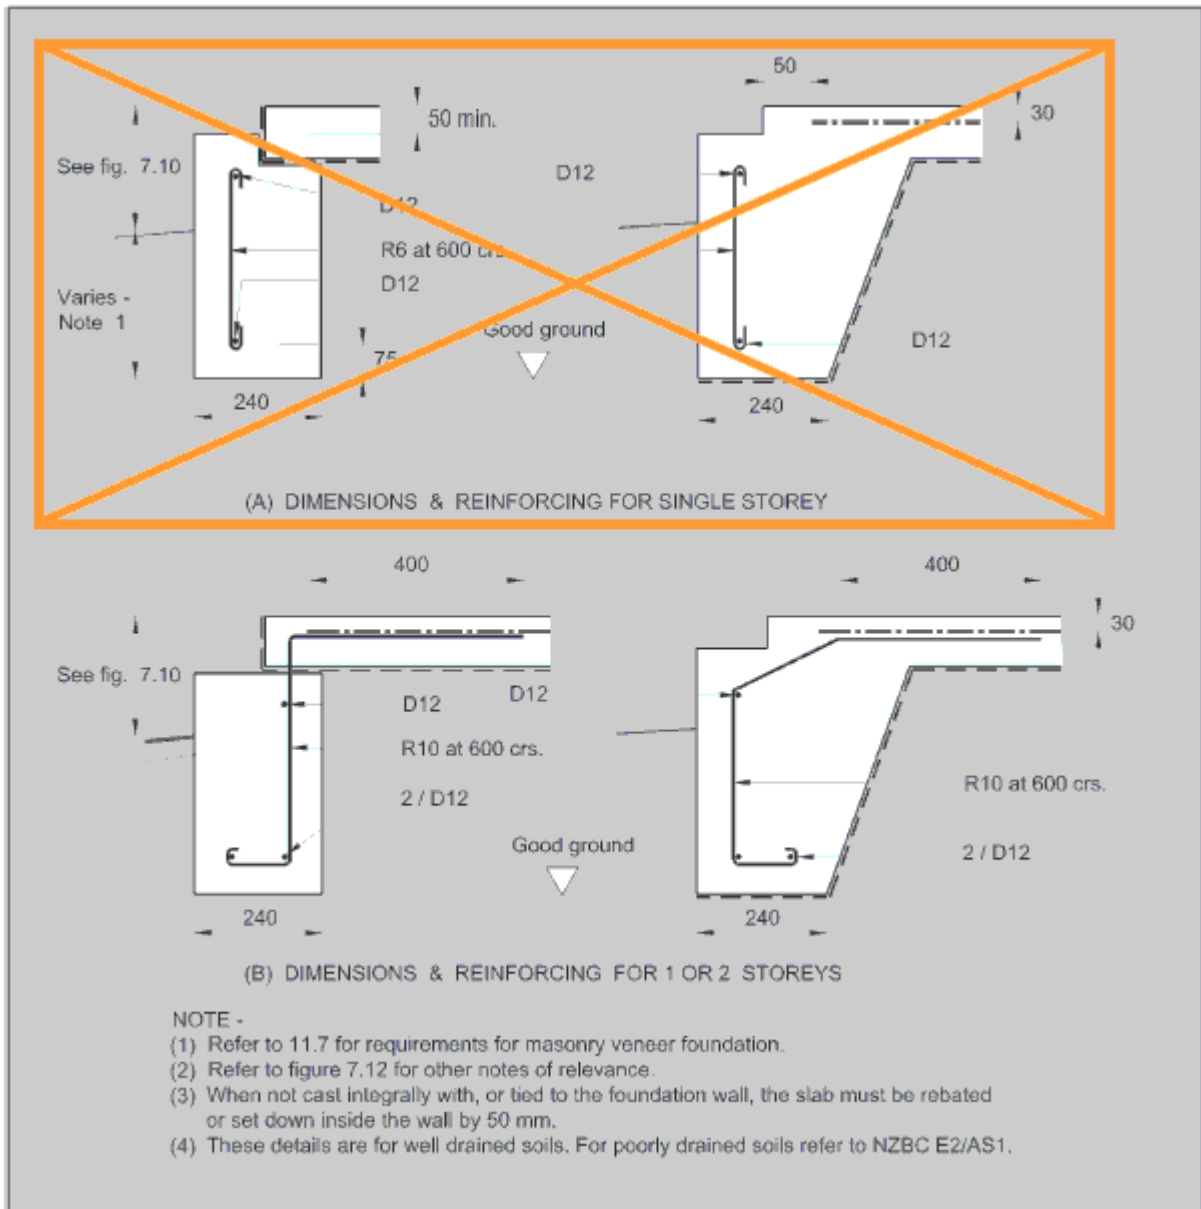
Masonry veneer foundation edge details - In situ concrete
